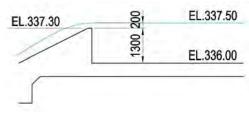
Water Level at Downstream (Oeste Dam)
